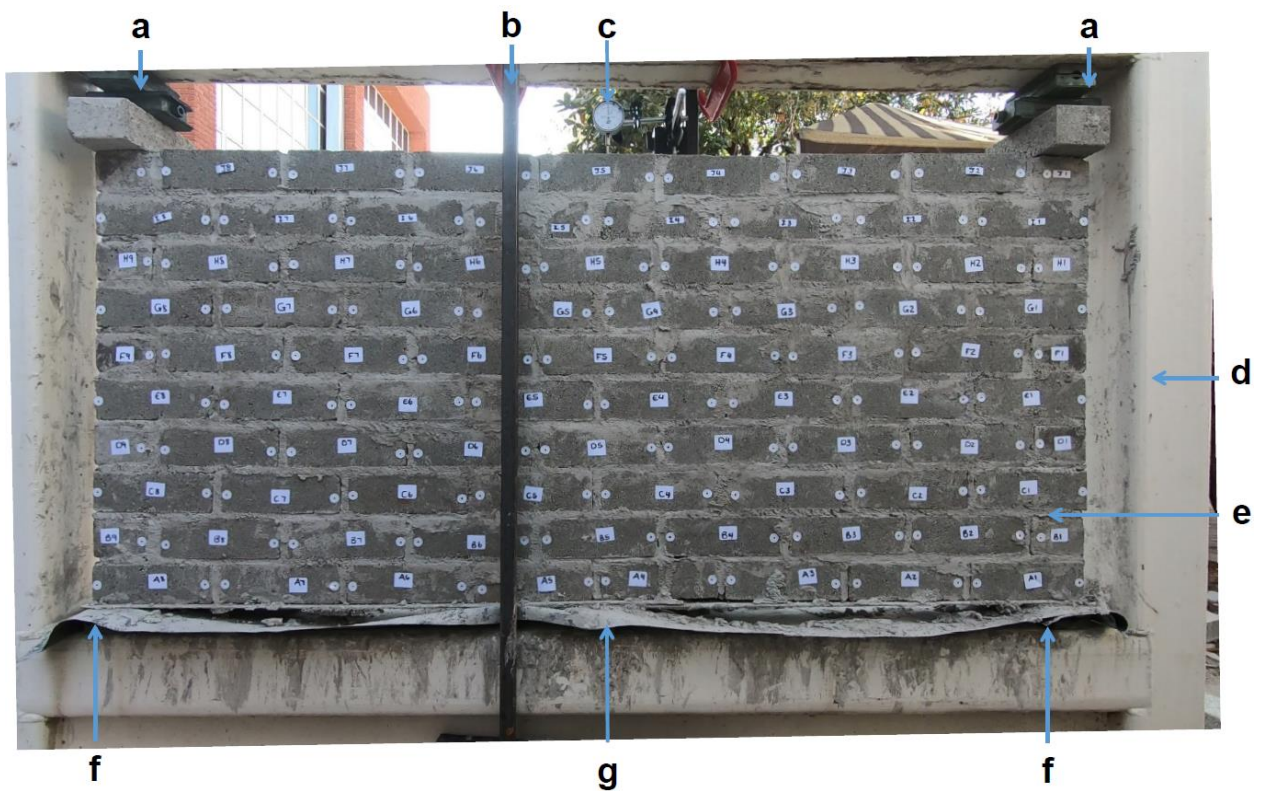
Experimental wall panel inside the steel frame a. Top industrial levelling jacks, b. A safety beam, c. Dial gauge, d. Steel frame, e. Experimental wall panel, f. Bottom corner industrial levelling jacks, g. Bottom middle industrial levelling jack
